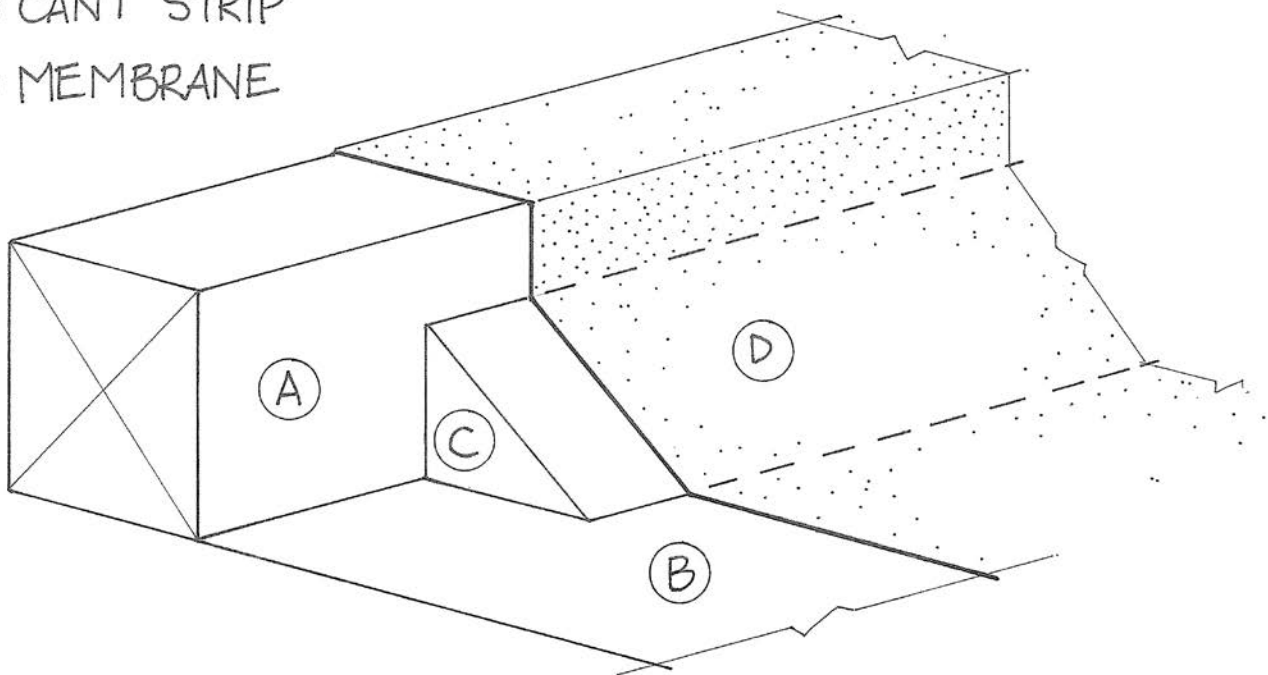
The placement of a cant strip can make angles easier to work with.
